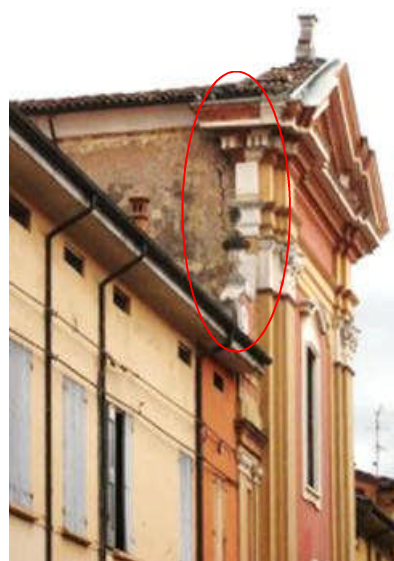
Undamaged church of Pieve Matildica in Sorbara.
